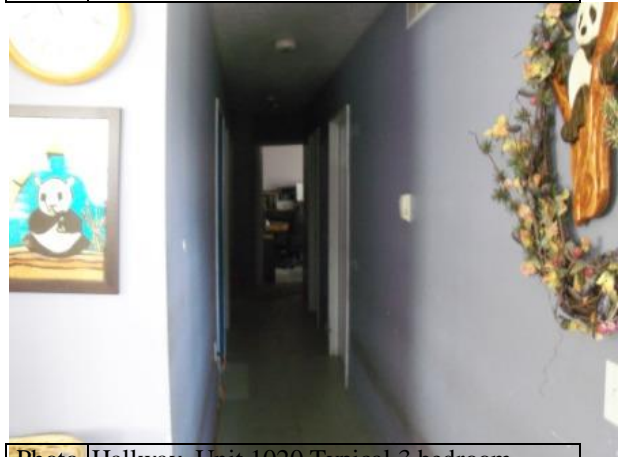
Hallway, Unit 1020 Typical 3 bedroom
